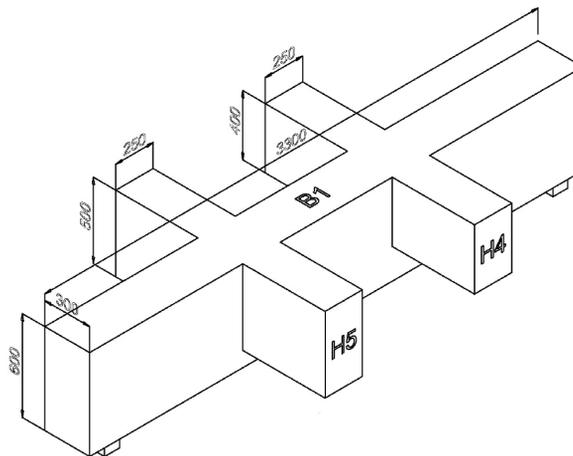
Description of specimen B1 (dimensions in mm) [1]
